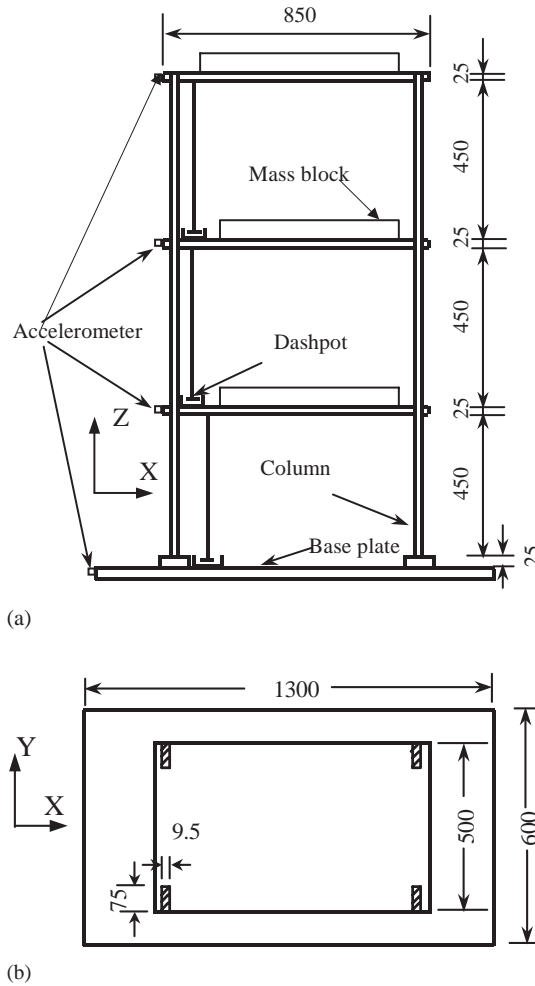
Configuration of a 3-storey near periodic building: (a) elevation, (b) plan (all dimensions in mm).
